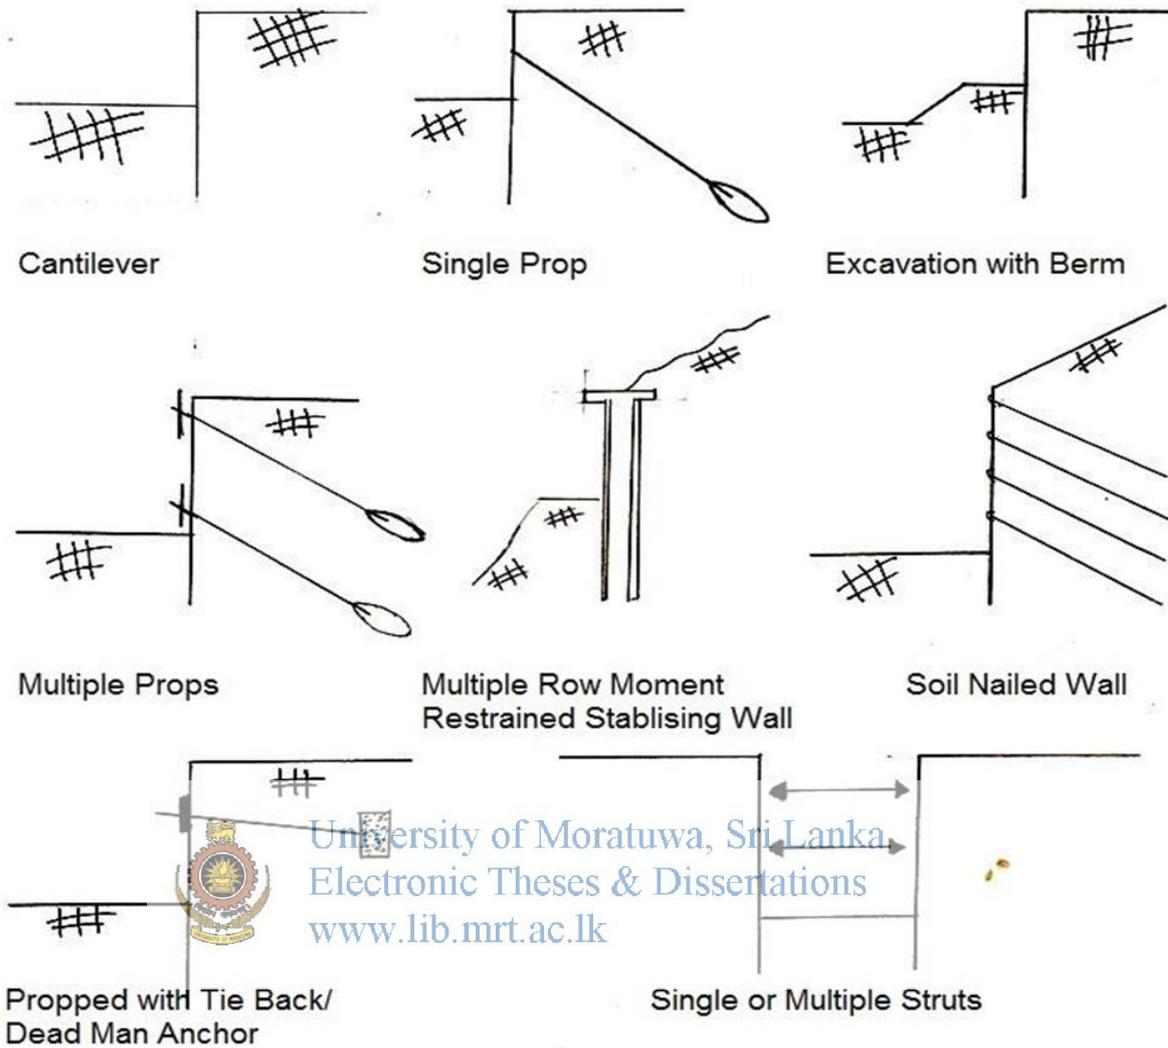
Methods to reduce the deformations in soil retaining structures
